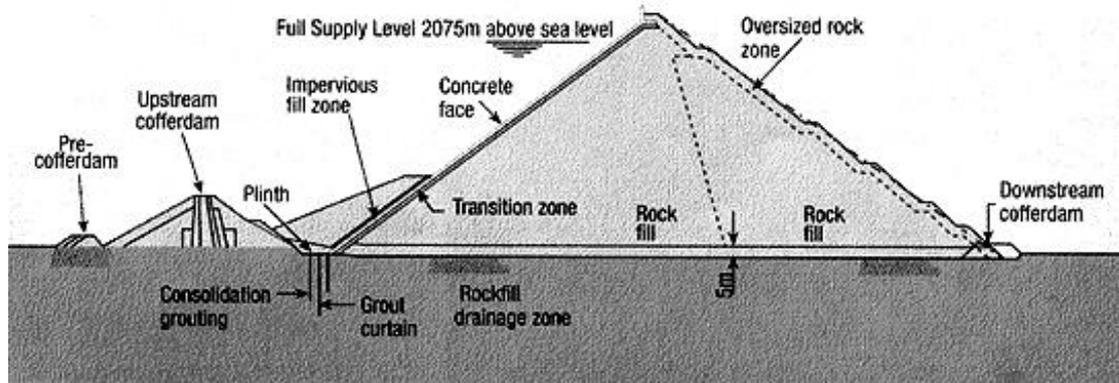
CFRD cross section with upstream and downstream cofferdams.
